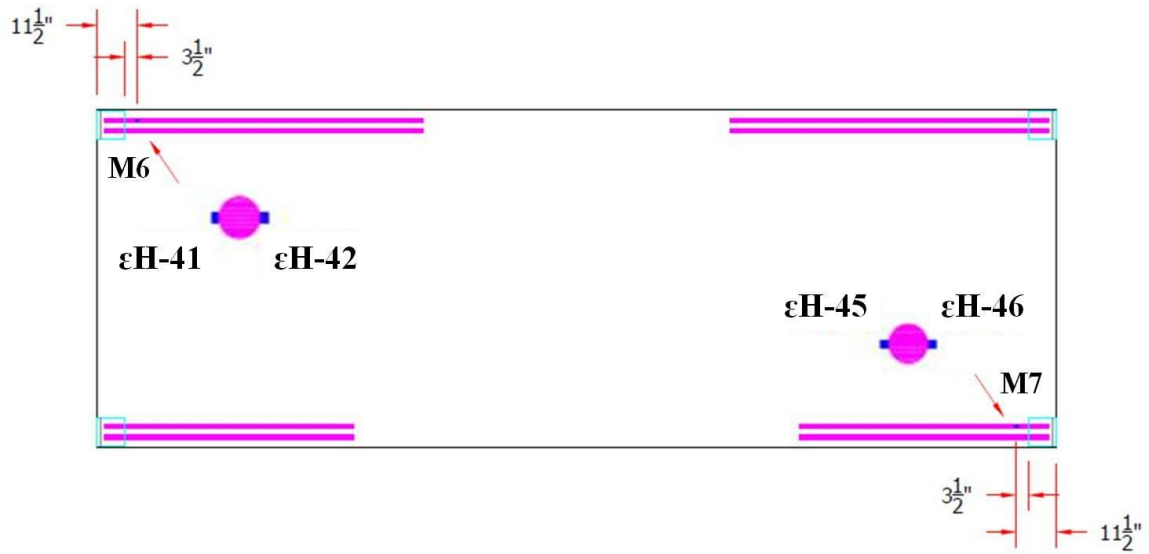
Beam-L – Internal strain gauges on steel anchor bars at M6 and M7 plates
